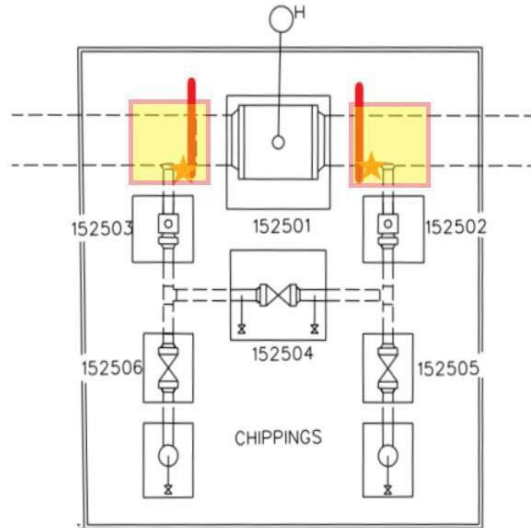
Excavation encroaching on heat affected zones of the block valve.
